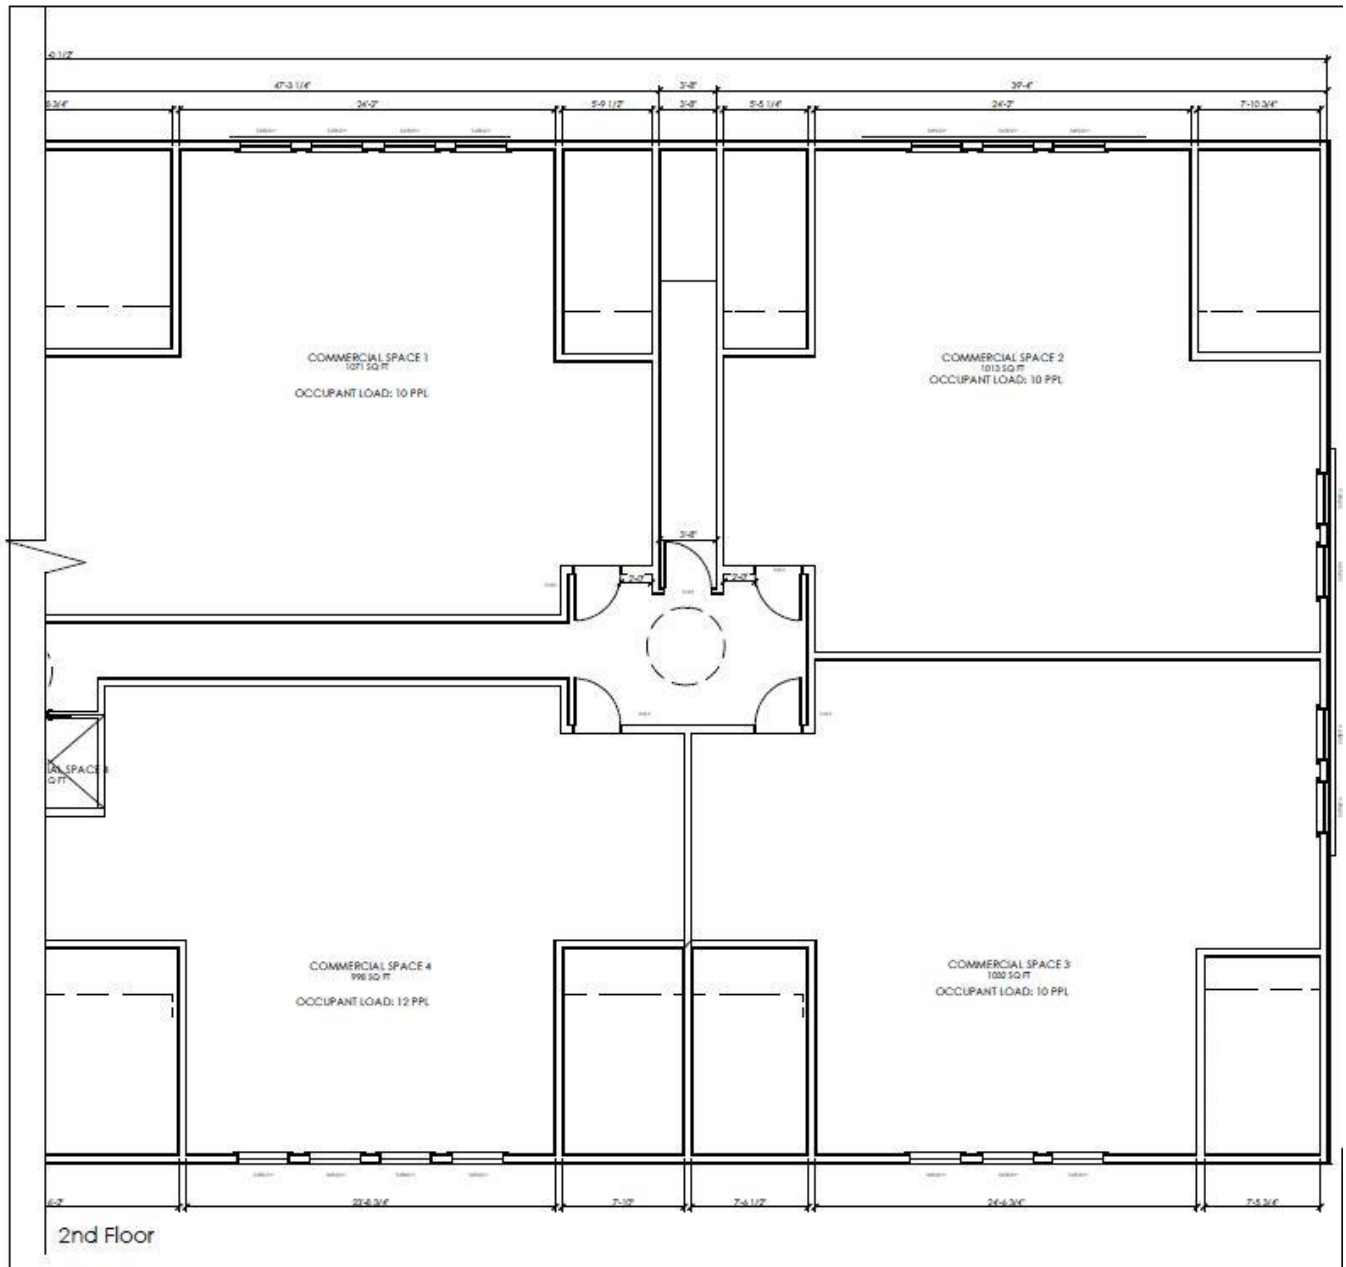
Floor Plans - 2nd Floor Commercial Units (Source: Wren Design Studio)
